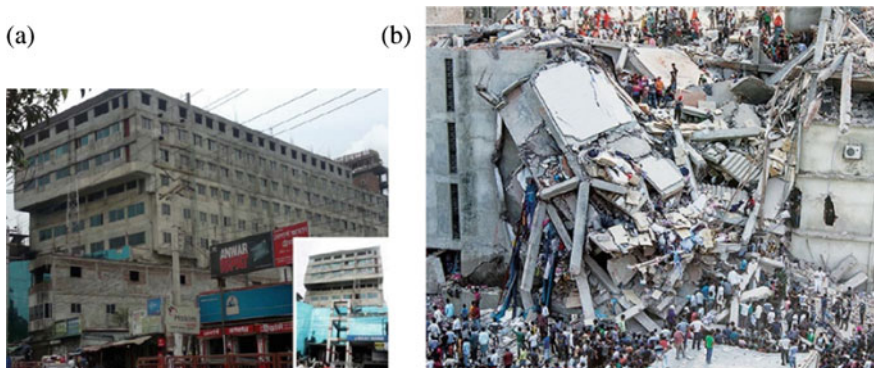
9 + 1 storied Rana Plaza Building, a before collapse [4], b after collapse in April 2013 [5]
